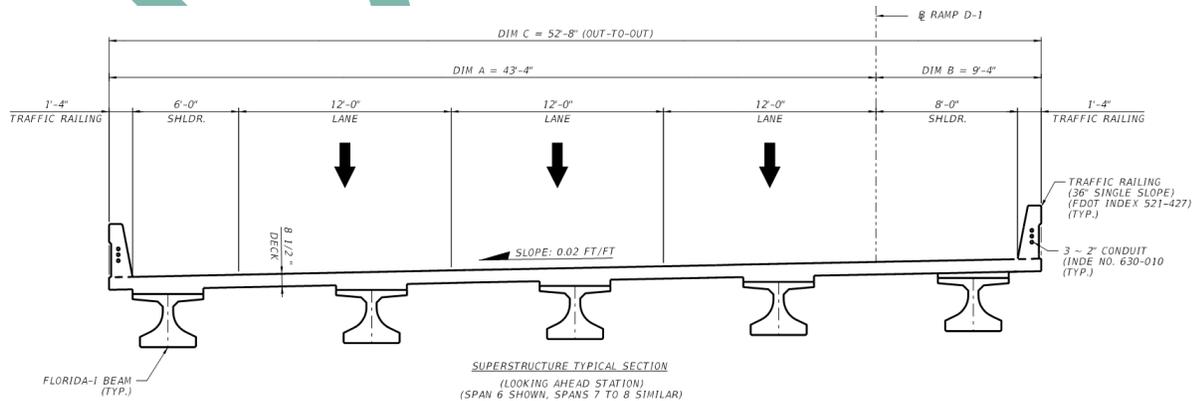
Bridge Typical Section (Bridge No. 13) 2 of 2
